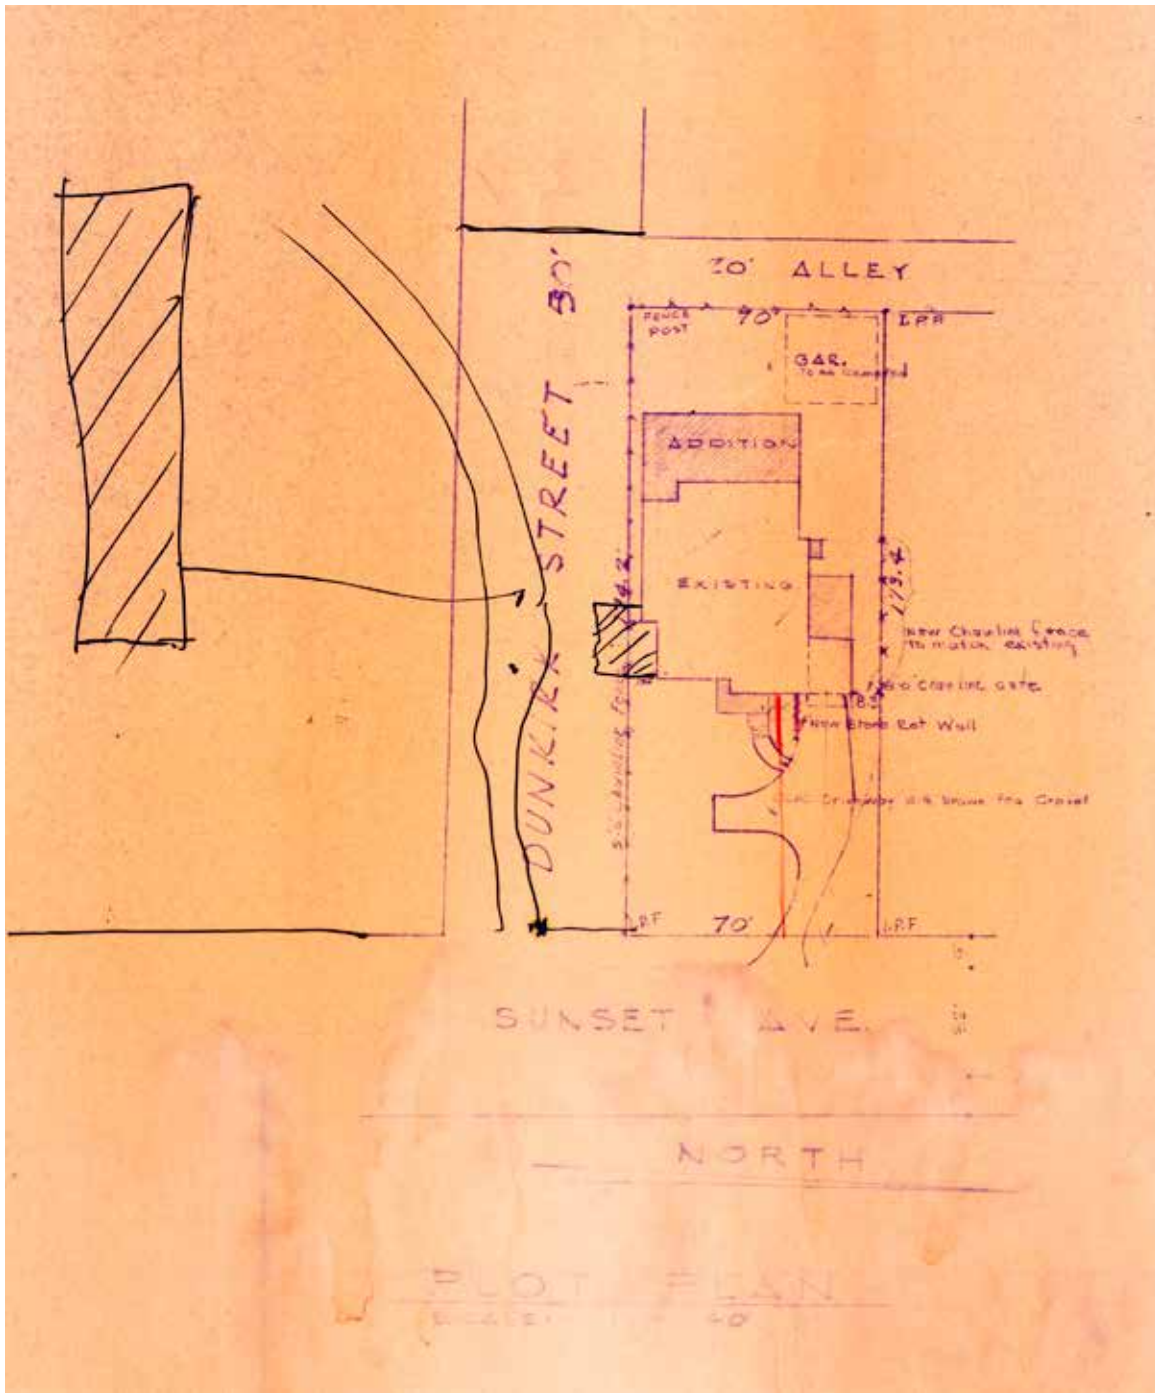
Enlarged Plot Plan from A2 Foundation Plan, Window & Door Schedules, 12/1964, Joseph W Robinson, Designer. (Source: MALU Archives.)
